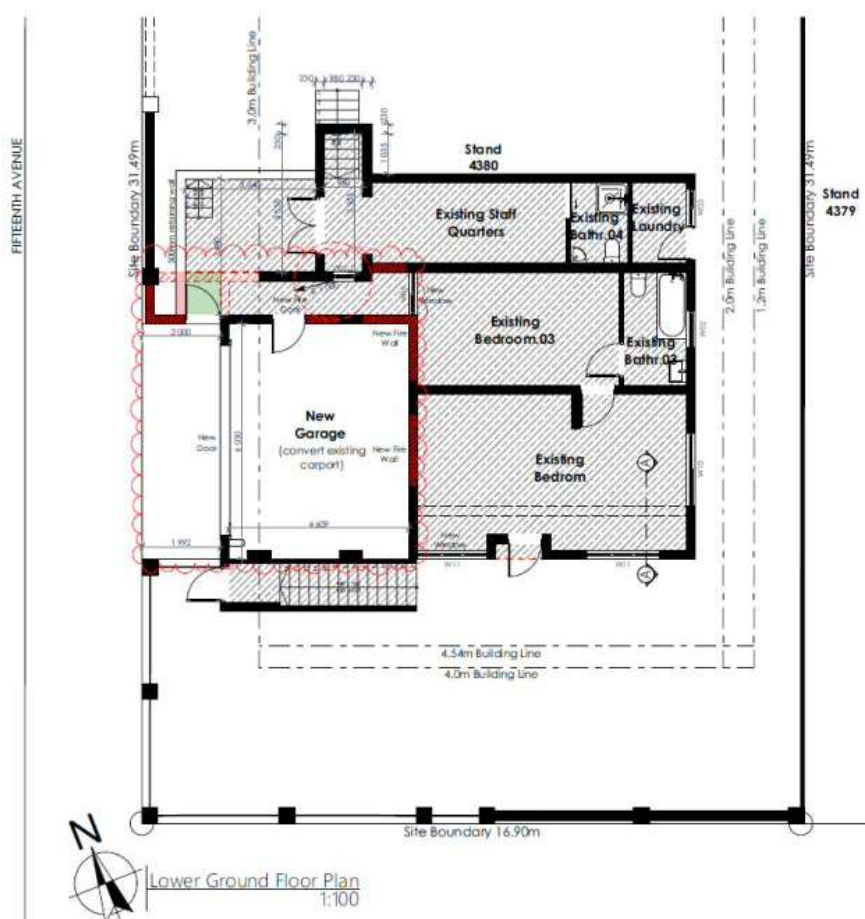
Lower ground floor layout plan — Erf 4380 Hermanus
